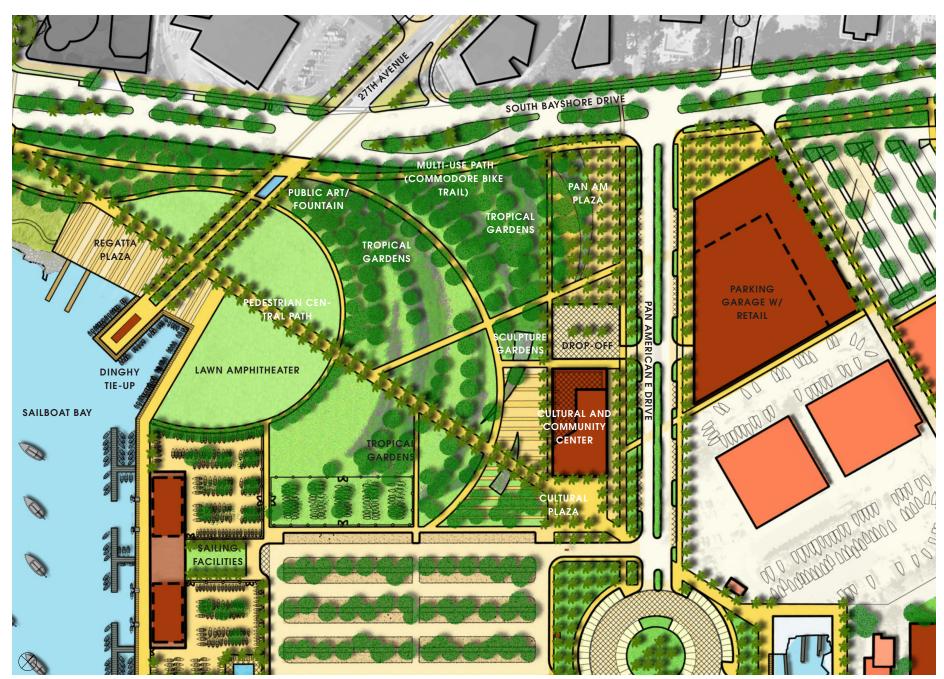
WATERFRONT PARK/CULTURAL CENTER DETAIL PLAN
